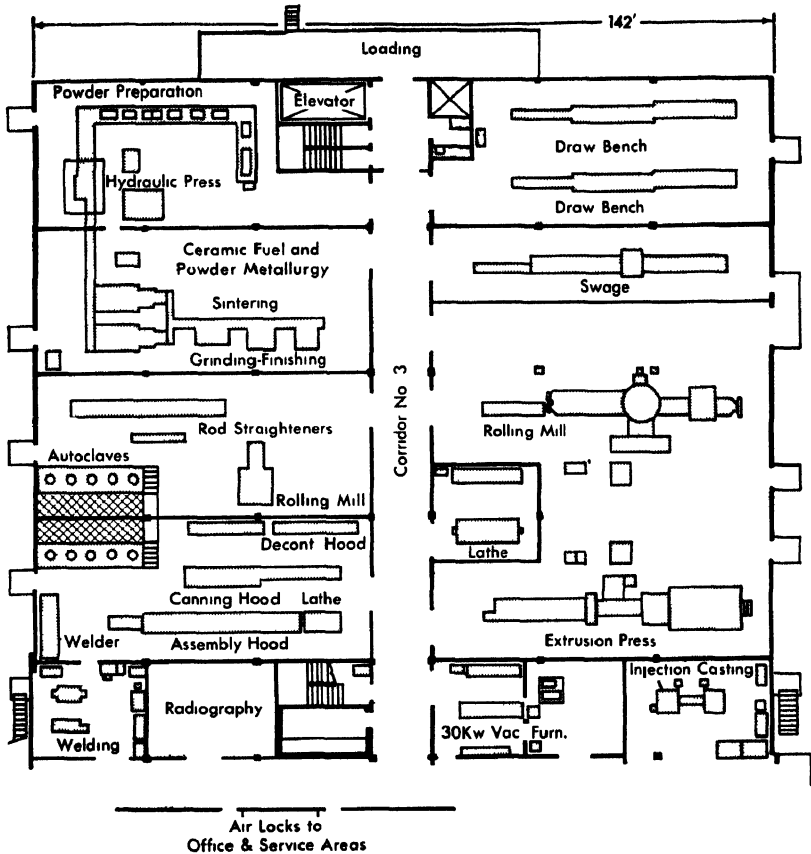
Plutonium fabrication pilot plant, first floor plan.
